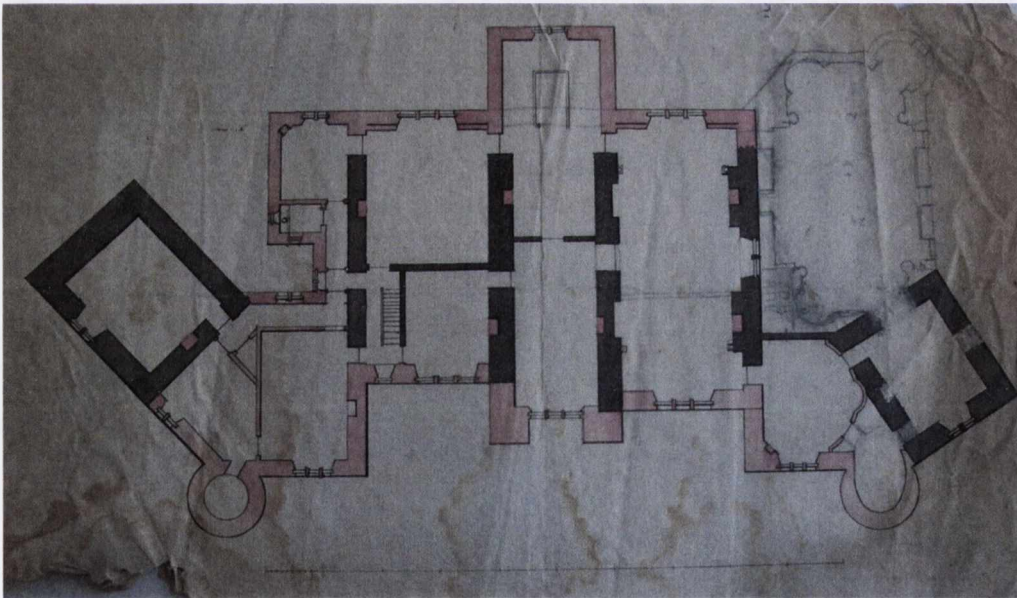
Birr Castle, proposed ground floor plan based on a survey, attrib. to John Johnston, [1802-1803], Rosse papers, O/17/18.
